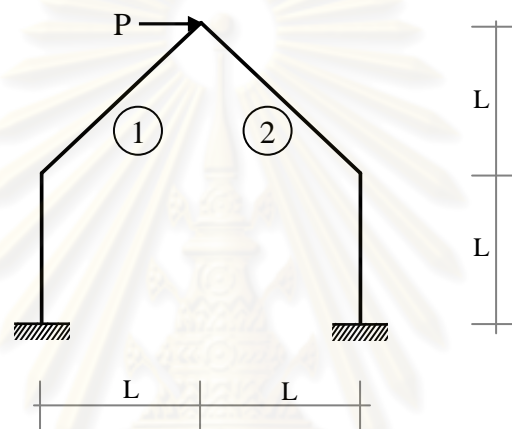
Schematic of gable frame subjected to horizontal load at the vertex.
